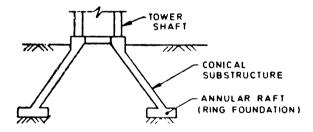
CONICAL SUBSTRUCTURE FOR TOWERS
